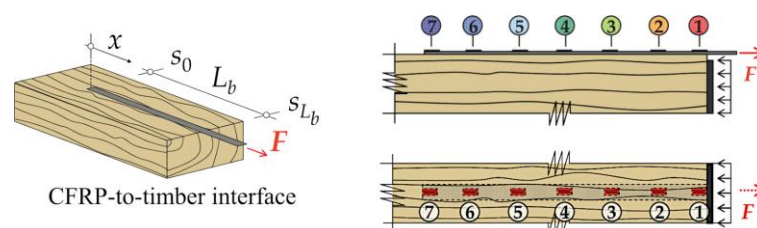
Single-lap shear test, with strain gauges 1-7 installed on the CFRP laminate. Figure adapted from Biscaia et al. (2016).
